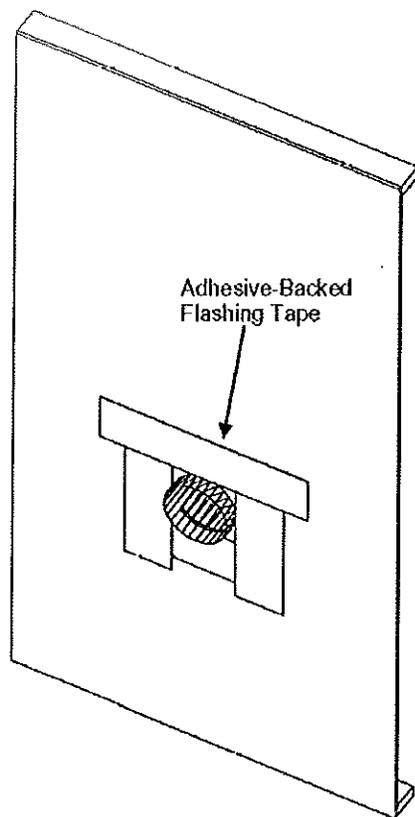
INSTALLATION AT PENETRATION OPENING (NON-FIRE-RESISTANCE RATED)
